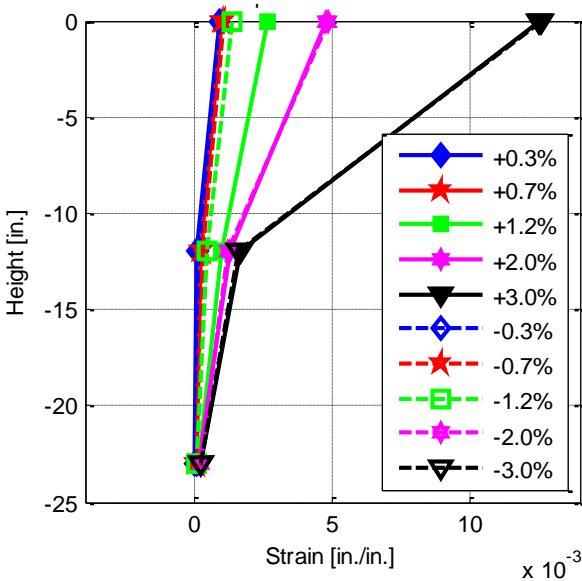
Strain profiles in reinforcing bars of the column (until 3% drift) – DS-2
